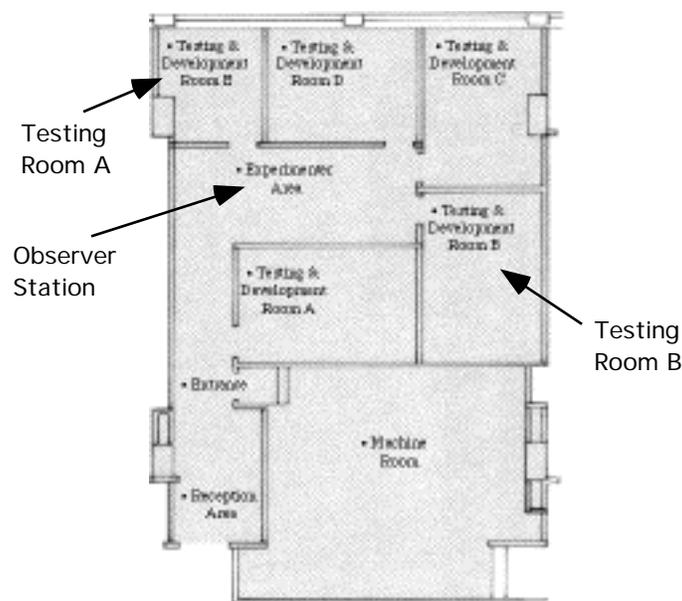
Floor plan of the HCI lab indicating the rooms in which the study was conducted.
